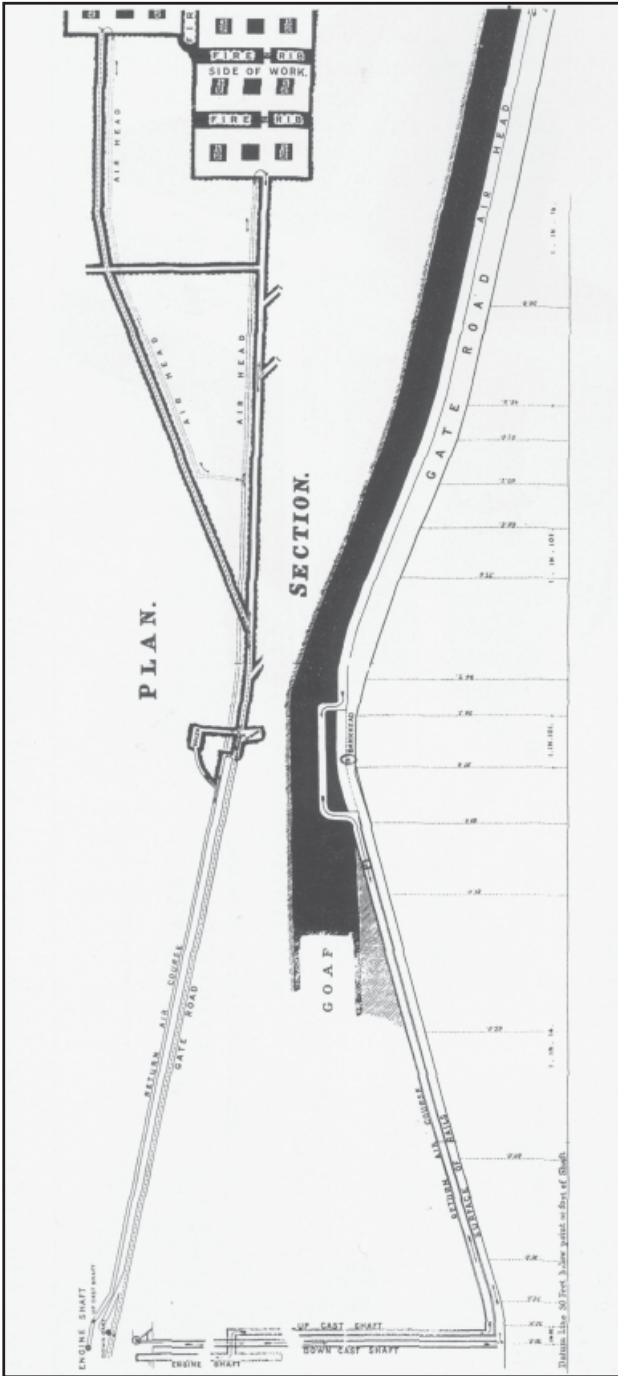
Plan and section of the haulage road at the Heath Colliery.
